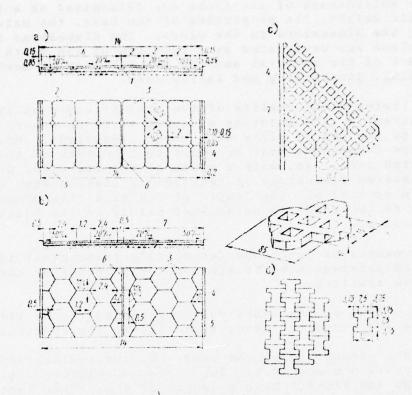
Prefabricated pavements made of different shaped concrete slabs: a-of square slabs with cut angles (Moscow, 1951); b-of hexagonal slabs (Moscow, 1954); c-of cross-shaped slabs with openings (Germany, 1940); d-of slabs with T-shaped profile; 1-concrete linings with a dimension 0.5x0.5x0.1 m under the junction of pavement slabs; 2-place where the slabs were joined with welding; 3-concrete slabs: square with a dimension 2x2x0.18 m, and hexagonal with a side 1.2 m and a thickness 0.16 m; 4-curb; 5-filling with monolith concrete (installation of half-slabs is also possible); 6-longitudinal temperature joint; 7-cruciform slab with aperatures (after laying the slabs, the openings are filled with gravel or crushed stone).
